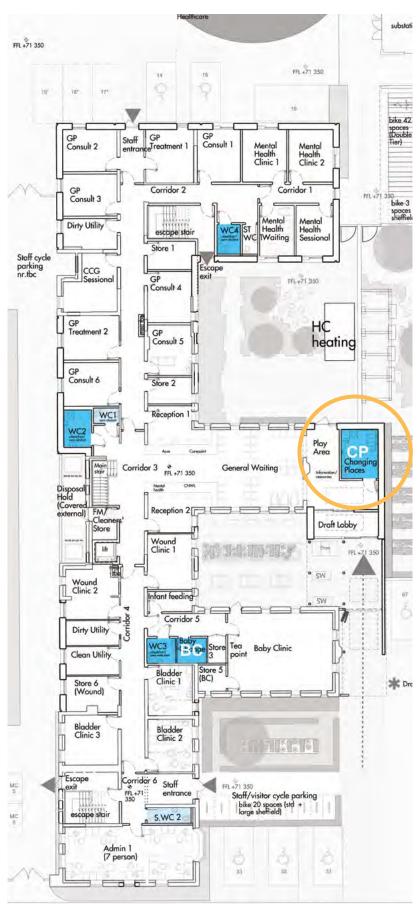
Proposed Changing Places layout - Healthcare Hub -
